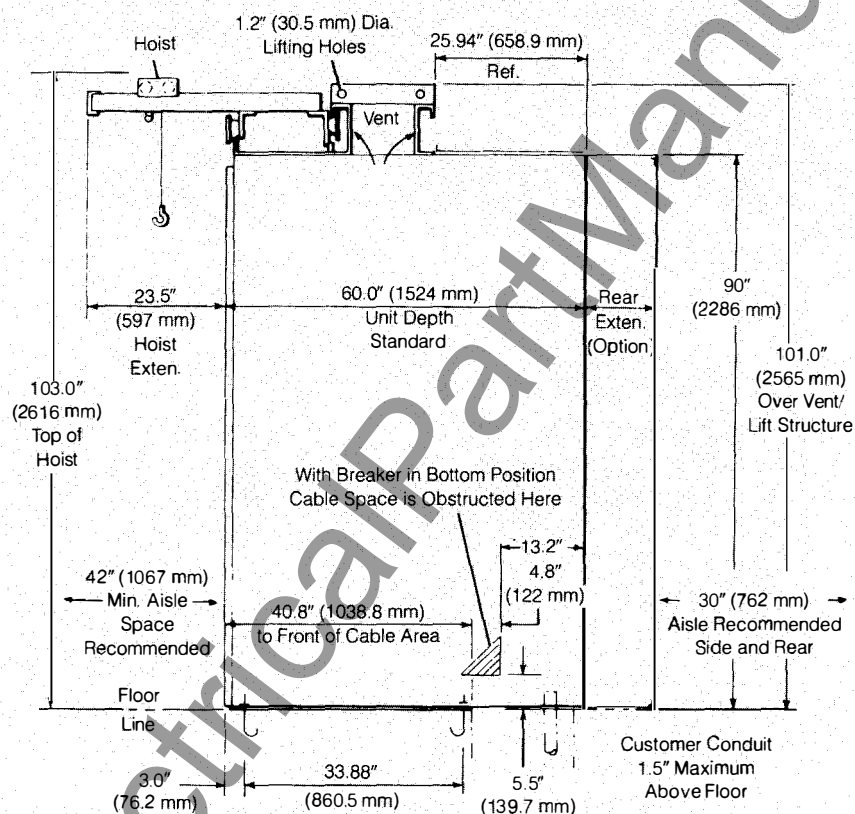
Dimensions, Floor Plan and Side View Type "R" Indoor Switchgear.
